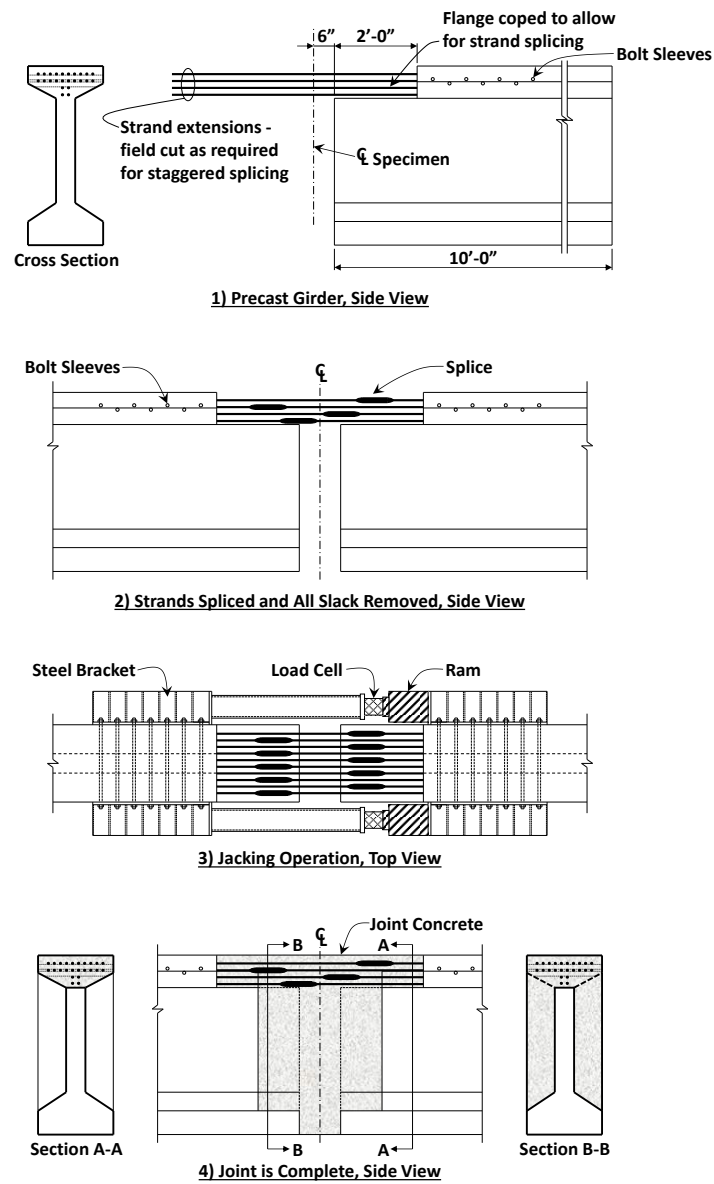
Splicing operation of test specimen (adapted from Tadros et al., 1993)
